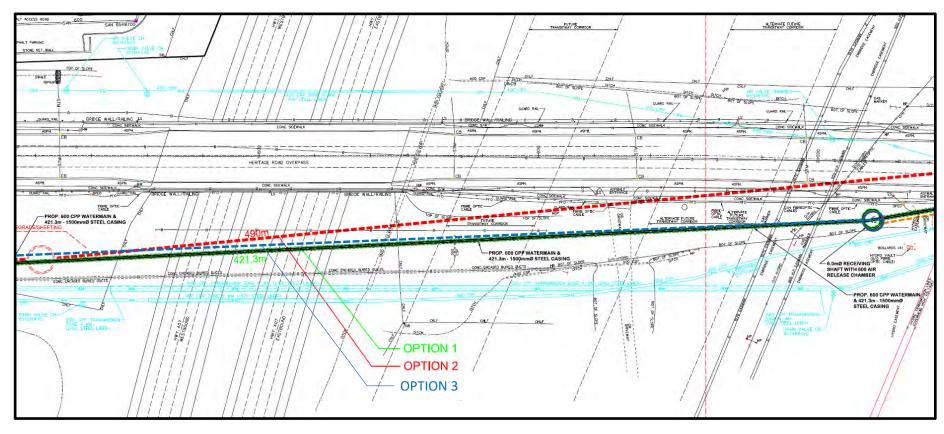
Edgeware Road to Meadowvale North Pumping Station Tunneling Section 2
